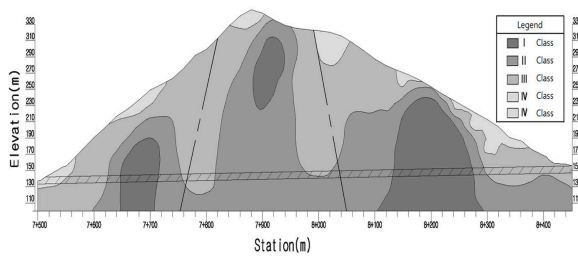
Ground Condition Cross Section View of Daegu Tunnel
